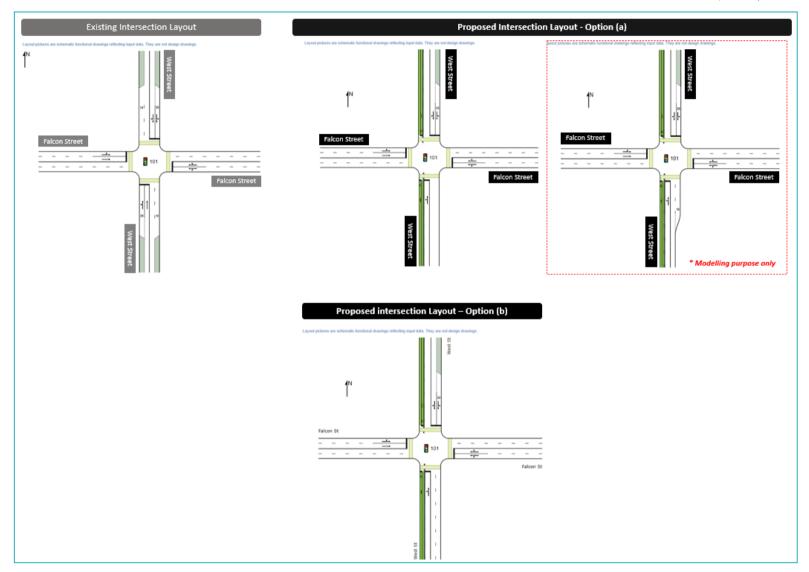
Existing and Proposed Layouts of the Falcon-West Street Intersection
